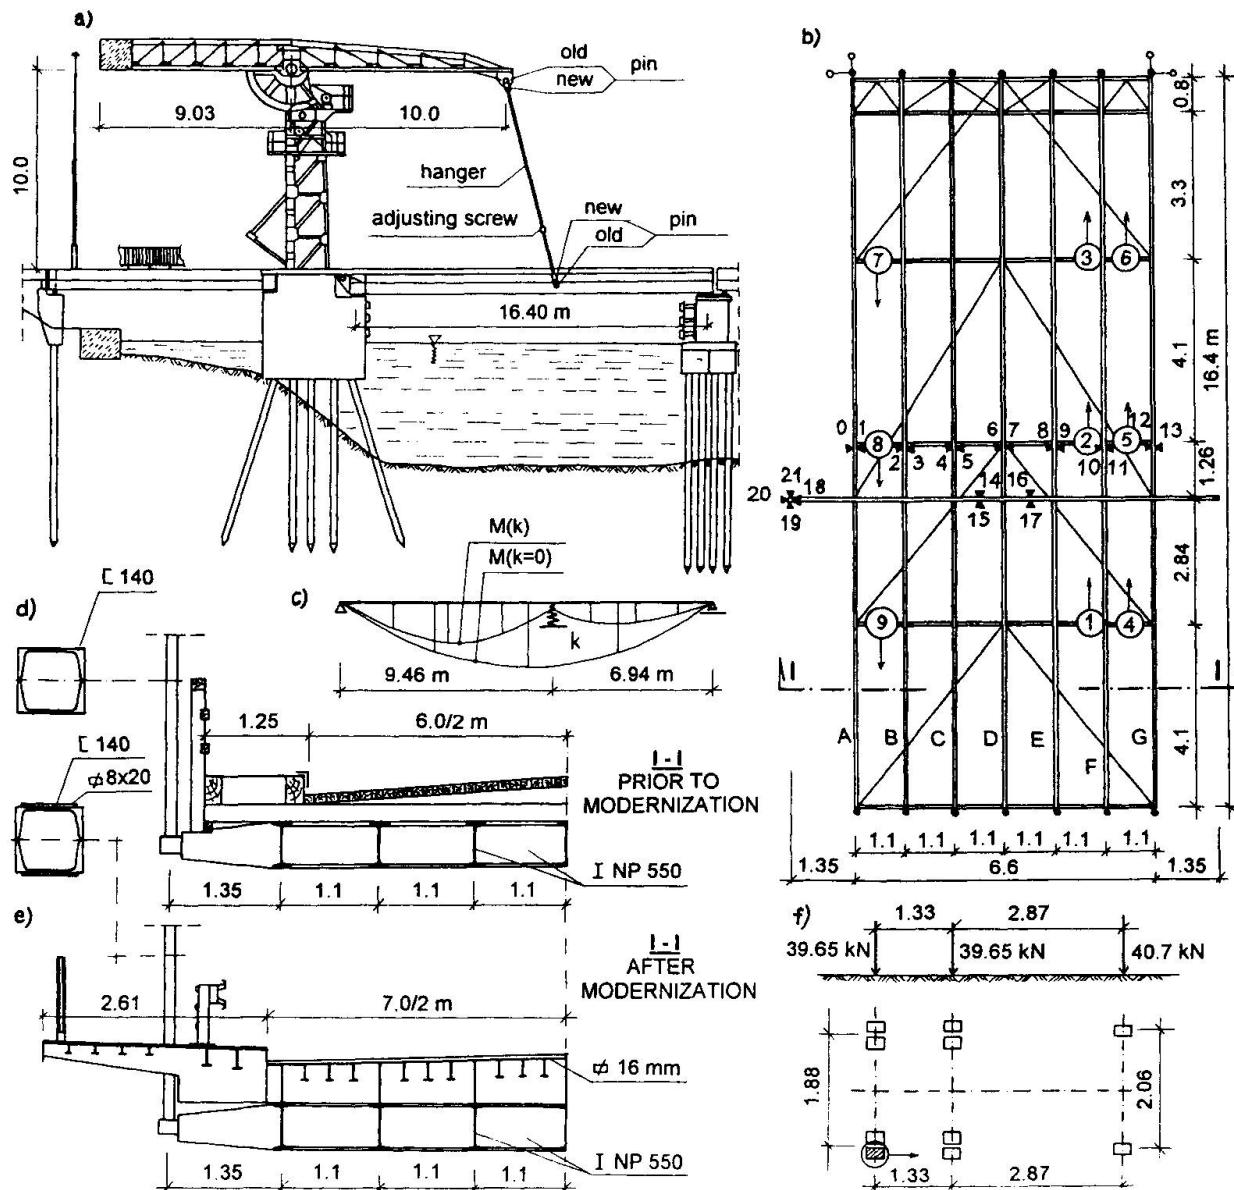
Bridge construction scheme prior to modernization and after modernization
